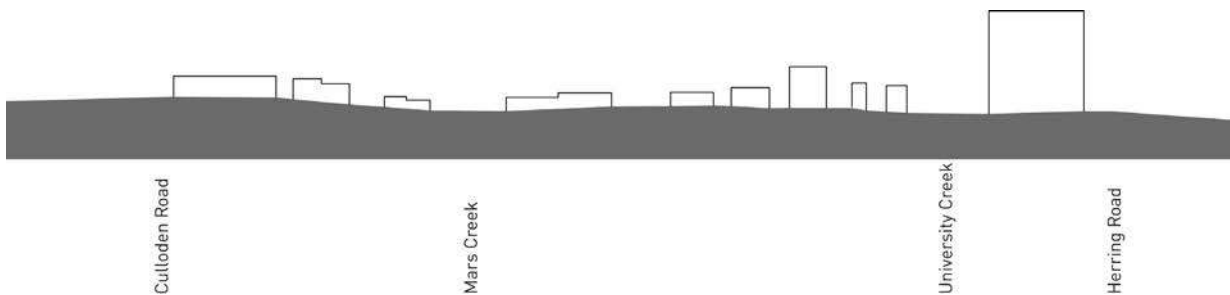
SECTION THROUGH CAMPUS SHOWING TOPOGRAPHY AND INDICATIVE BUILDING HEIGHTS
